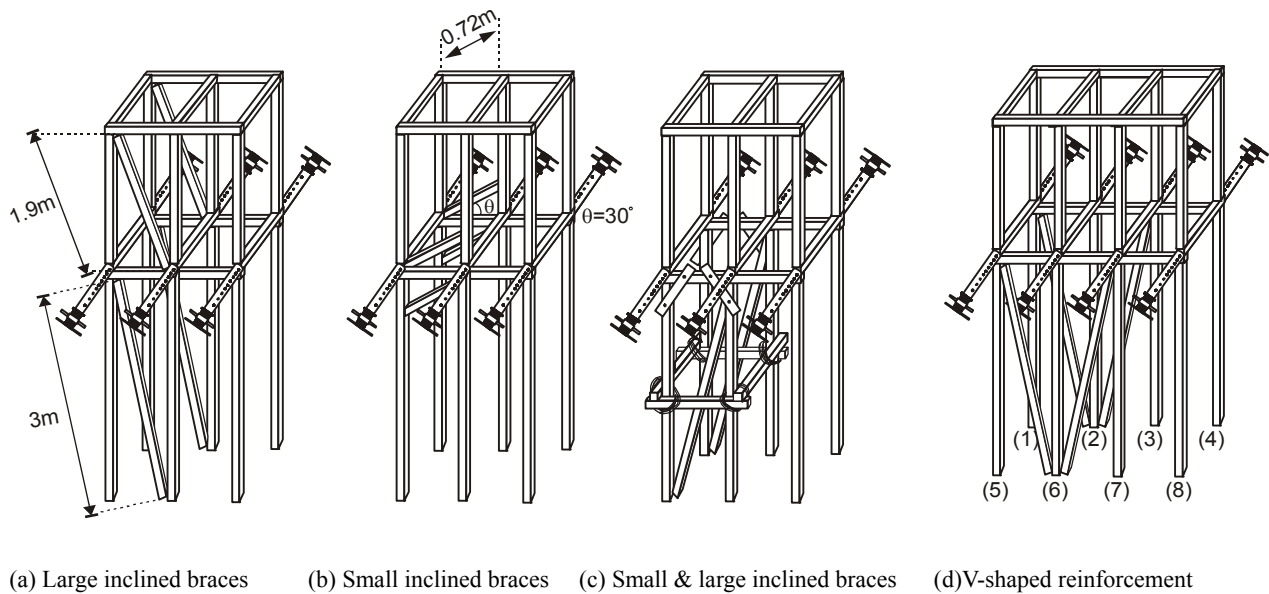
Arrangements of Double-layer Shoring Systems with Top and Bottom inclined Bracing Reinforcements
